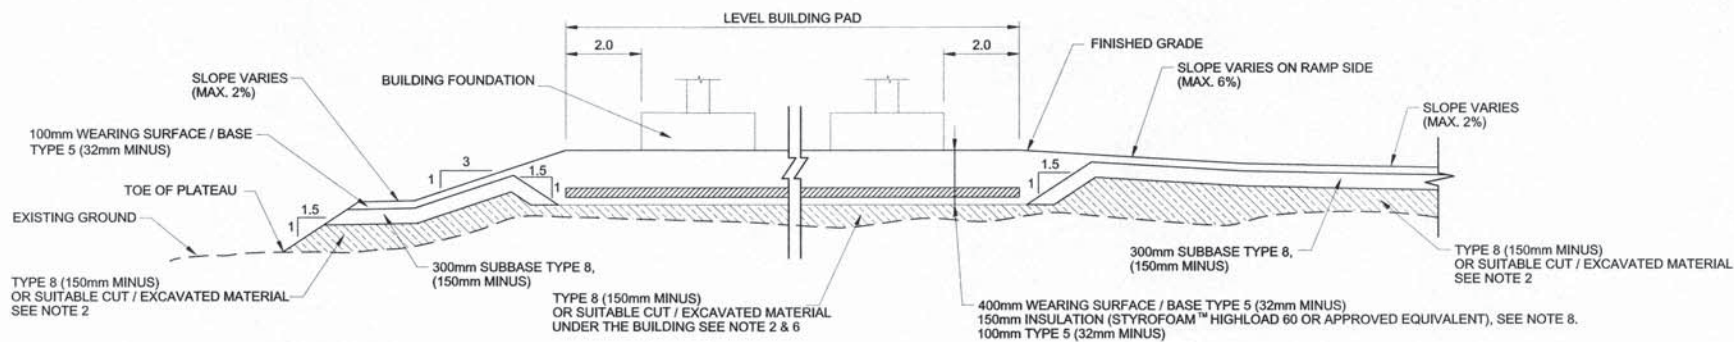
TYPICAL EARTHWORKS FOR SKIDDED BUILDINGS - ALL GROUND MATERIALS
